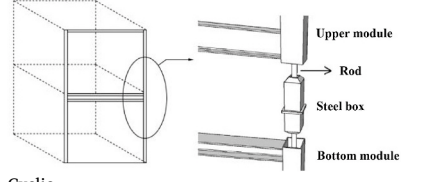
Connection system in modular steel construction (Adapted from Ref. [30]).
